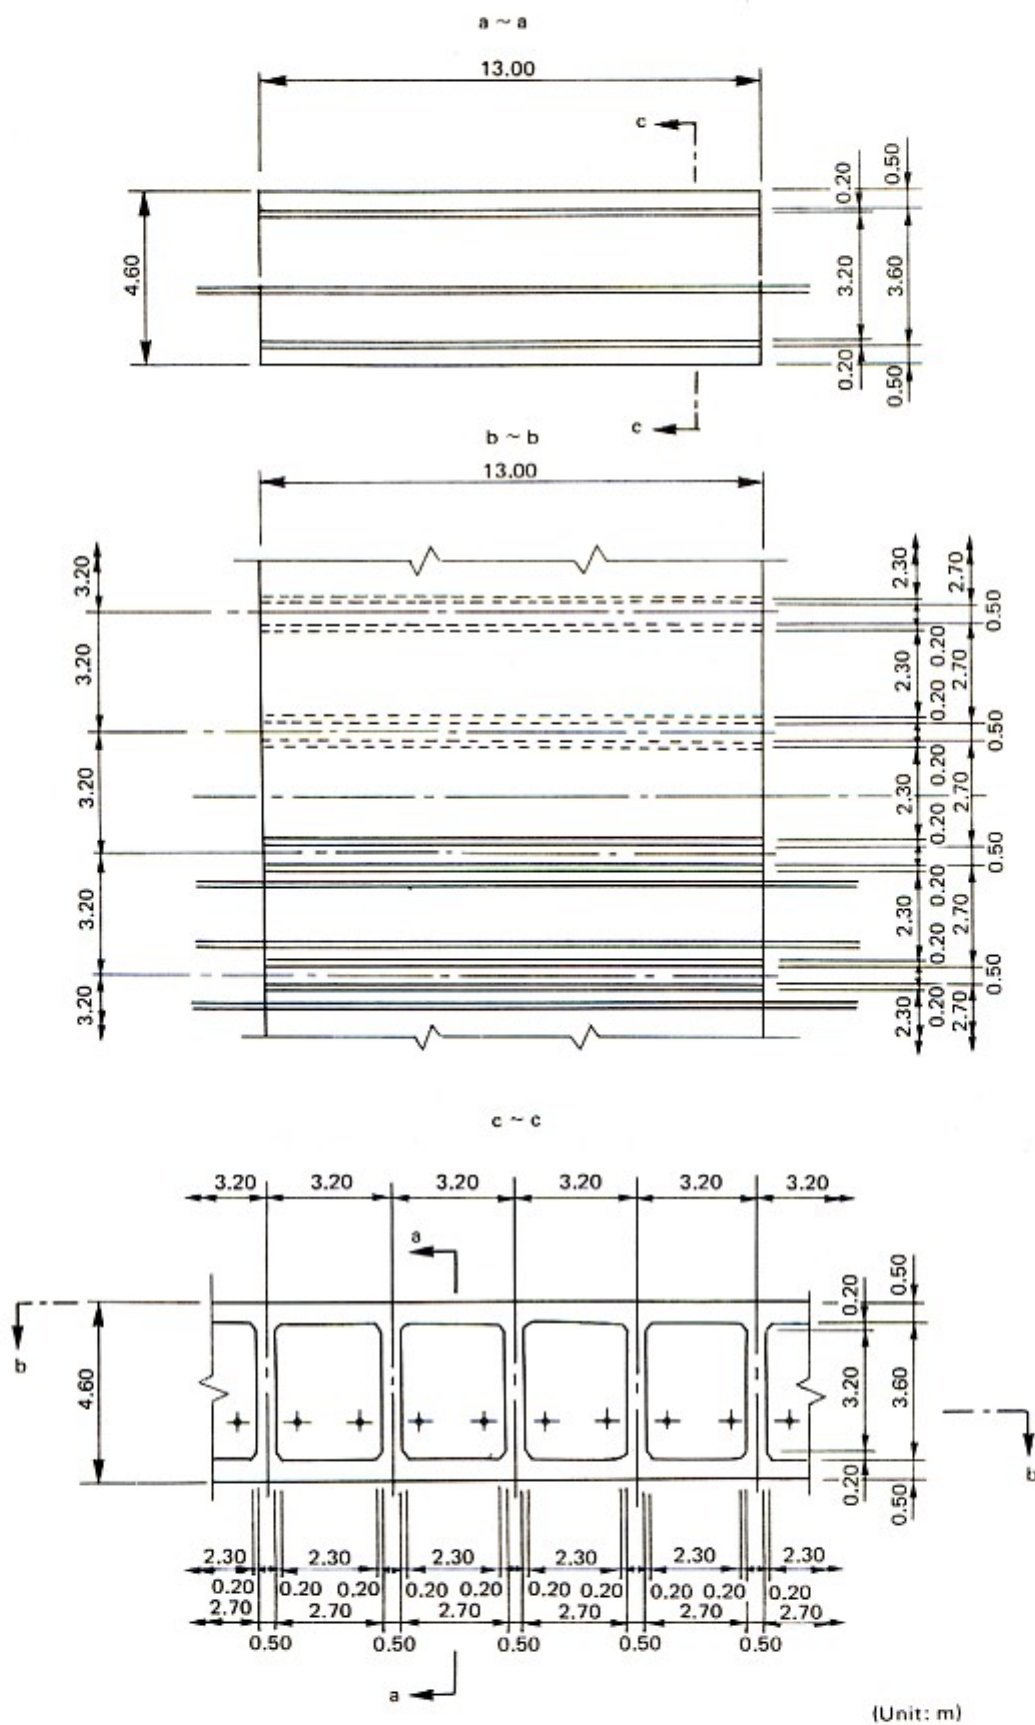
An Example of a Light Weight Reinforced Concrete Box
